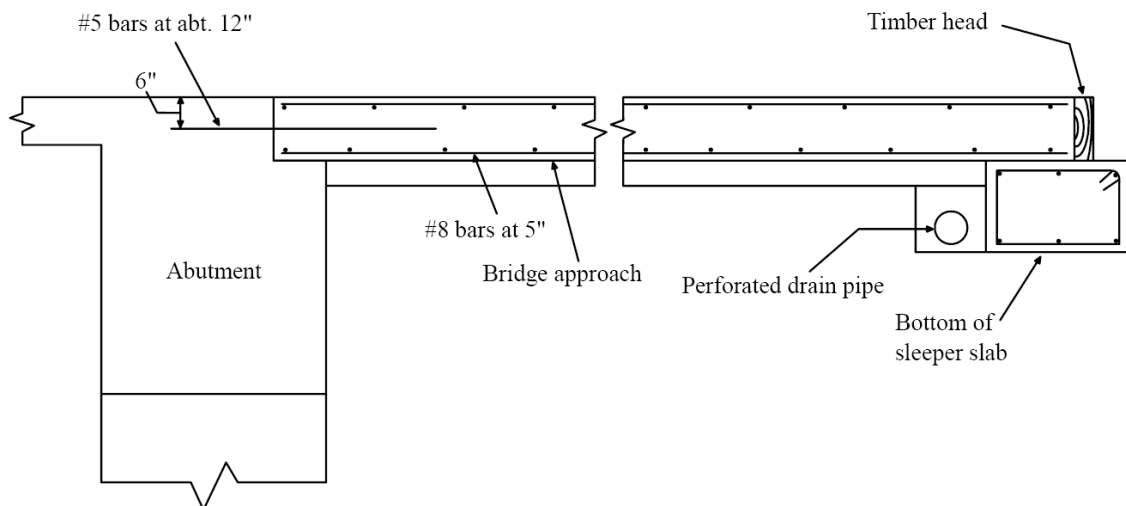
Bridge Approach Connected to Bridge Deck (Missouri DOT, 2003)
